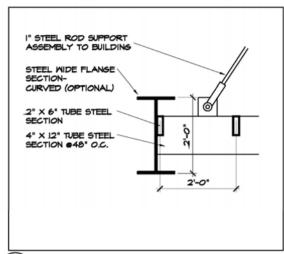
C FREEWAY COMMERCIAL (FC) ARCHITECTURALDETAILS
